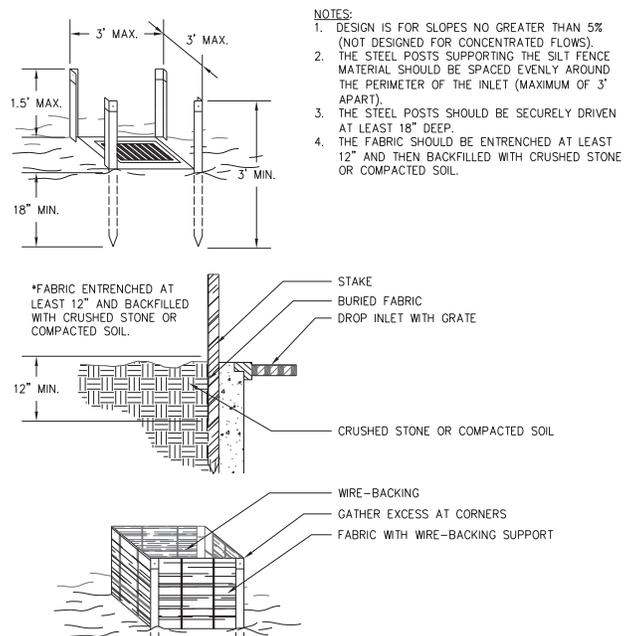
Filter Fabric with Supporting Frame Installation Requirements (Sd2-F)
